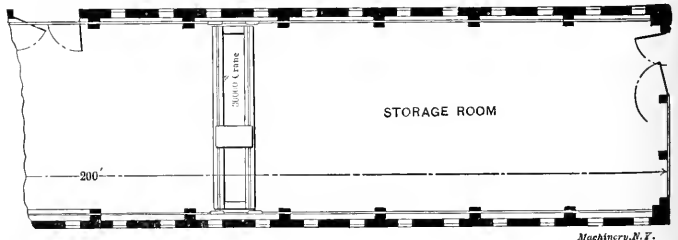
Recent Addition for Storage. Joins above Plan at A.
